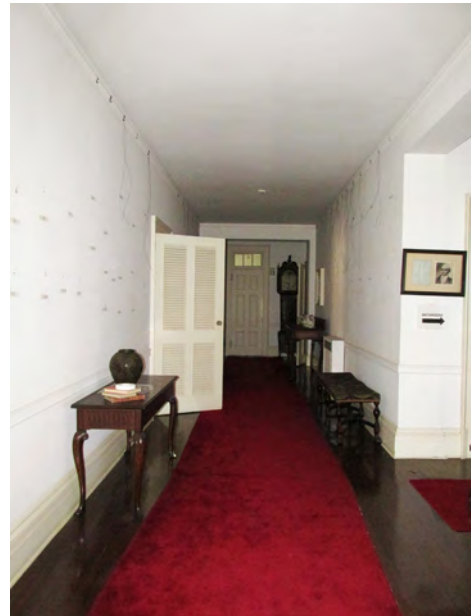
Second floor Corridor (203), looking south. (HA, 2015)
